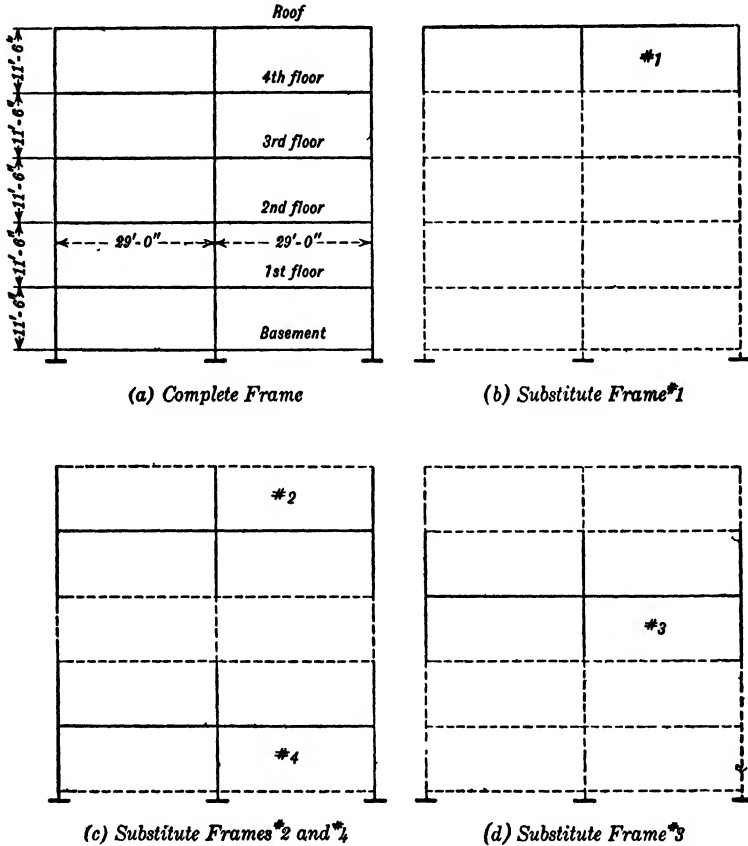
Two-span, Four-story Building Frame. (See p. 416.)
